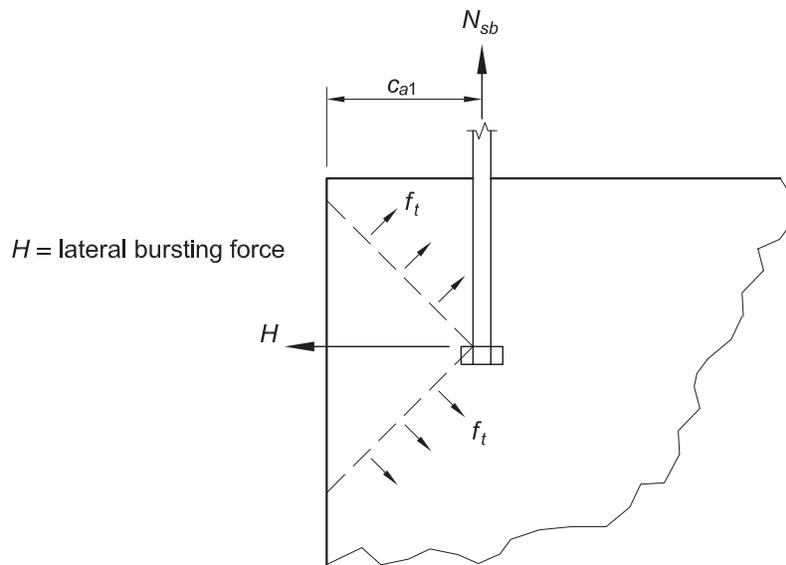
Lateral bursting forces for anchor rods in tension near an edge.
